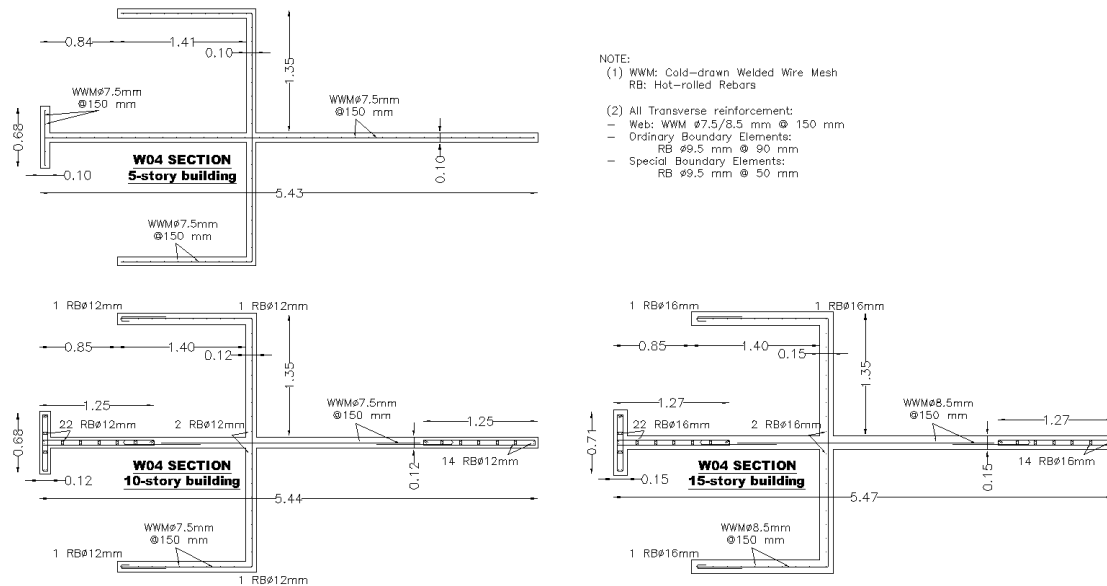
Comparison of the reinforcement configuration provided for the W04 wall piers in the 5-, 10- and 15-story buildings. Units: meters
